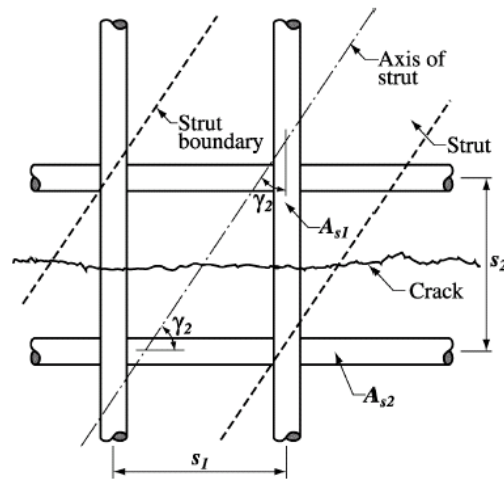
Reinforcement crossing a strut (ACI 318-02R)
